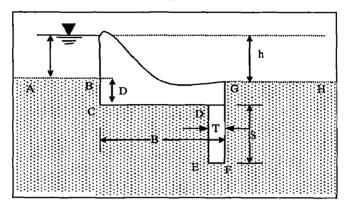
Depressed weir with concrete cutoff downstream B=Total horizontal floor length, T=Thickness of concrete cutoff
